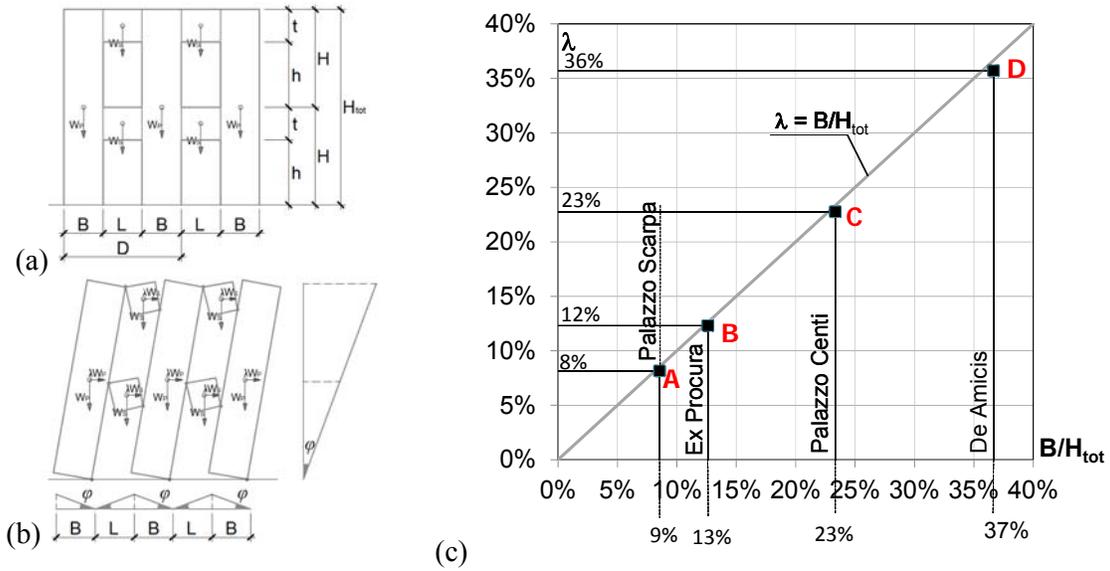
Limit analysis: (a) geometry of masonry wall; (b) frame collapse mechanism; (c) horizontal collapse multipliers for the principal façades of the building case studies.
